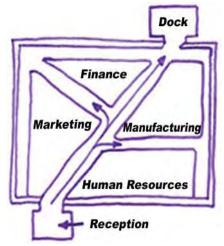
A typical blocking diagram demonstrating the fit into the floor plan.
